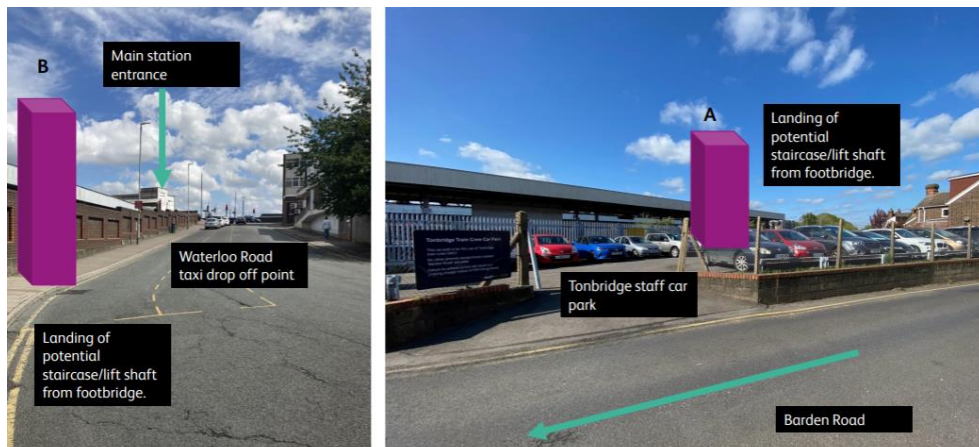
3D visualisation of what a footbridge from Barden Road to Waterloo Road could look like. This has been reviewed before by Network Rail. Source: Network Rail.
